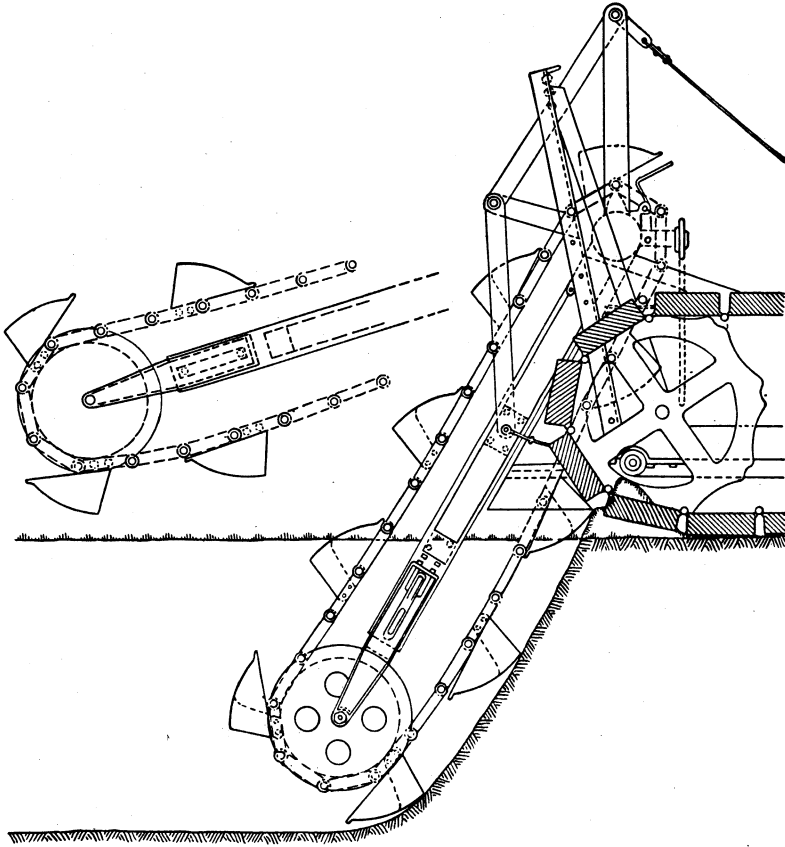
Digging mechanism of a common type of endless-chain excavator
